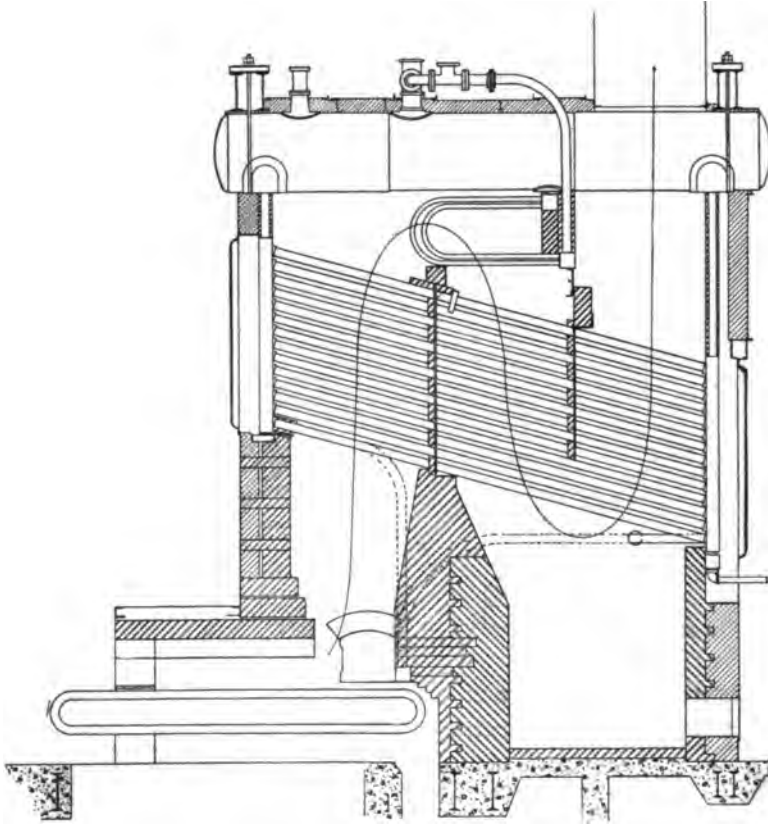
Special setting of chain-grate stoker and Babcock & Wilcox water-tube boiler.
